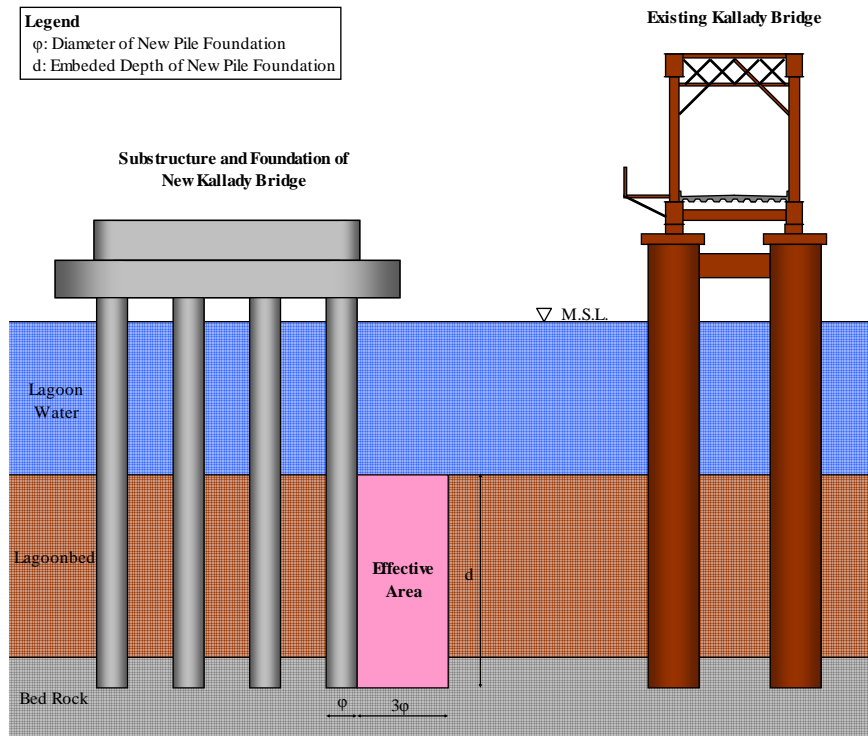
Effective Area of New Bridge Foundation Construction (Case of New Foundation being Cast-In-Situ Pile)
